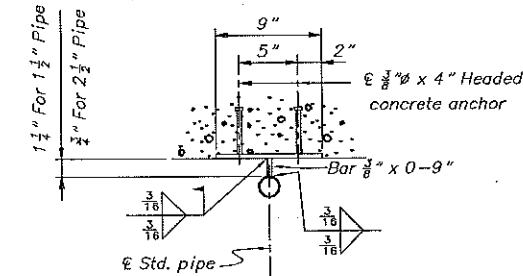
(For slabs 1'-2 inch thick or greater)
